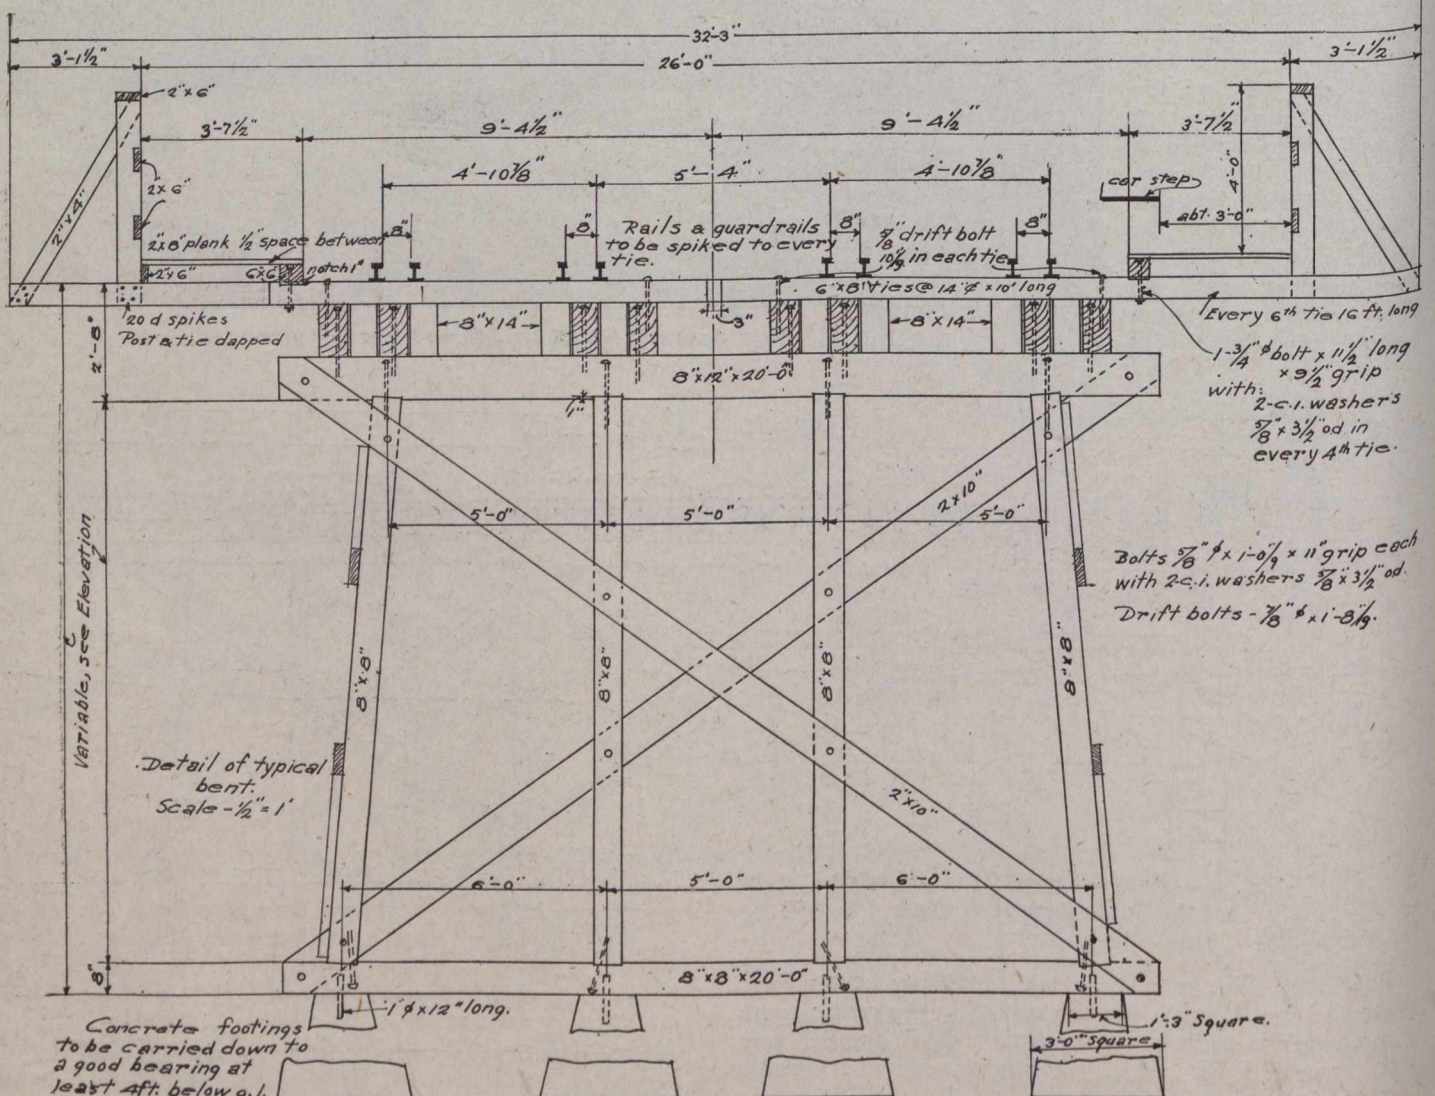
Cross-section of C.P.R. Trestle; Floor of the Sidehill Trestle is the Same Construction.
